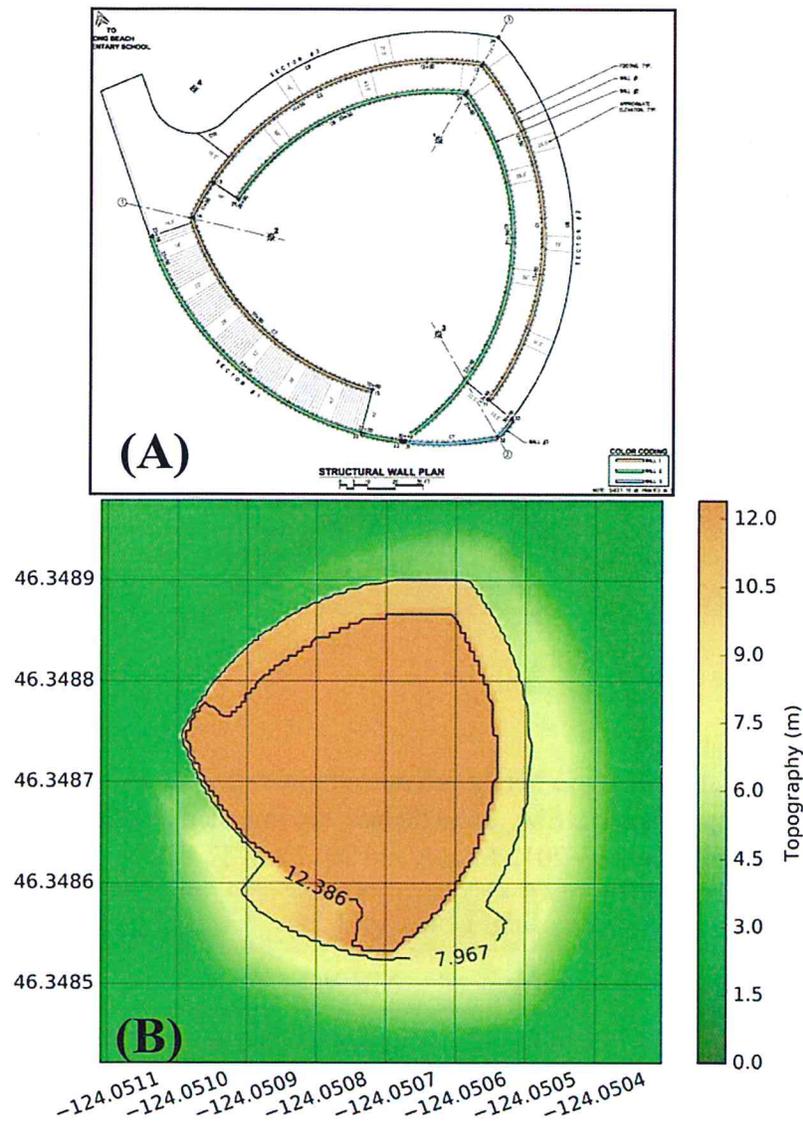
(A): PND berm plan view and elevation (m) with respect to local grade. (B): Berm DEM, interpolated to a spatial resolution of approximately 0.13 m.
